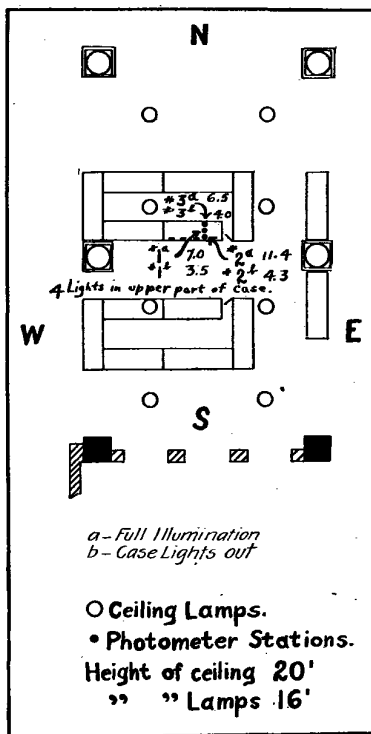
Section plan of main floor, (plated silver ware), showing location of furniture, pillars, lighting units, test stations and illumination data.
